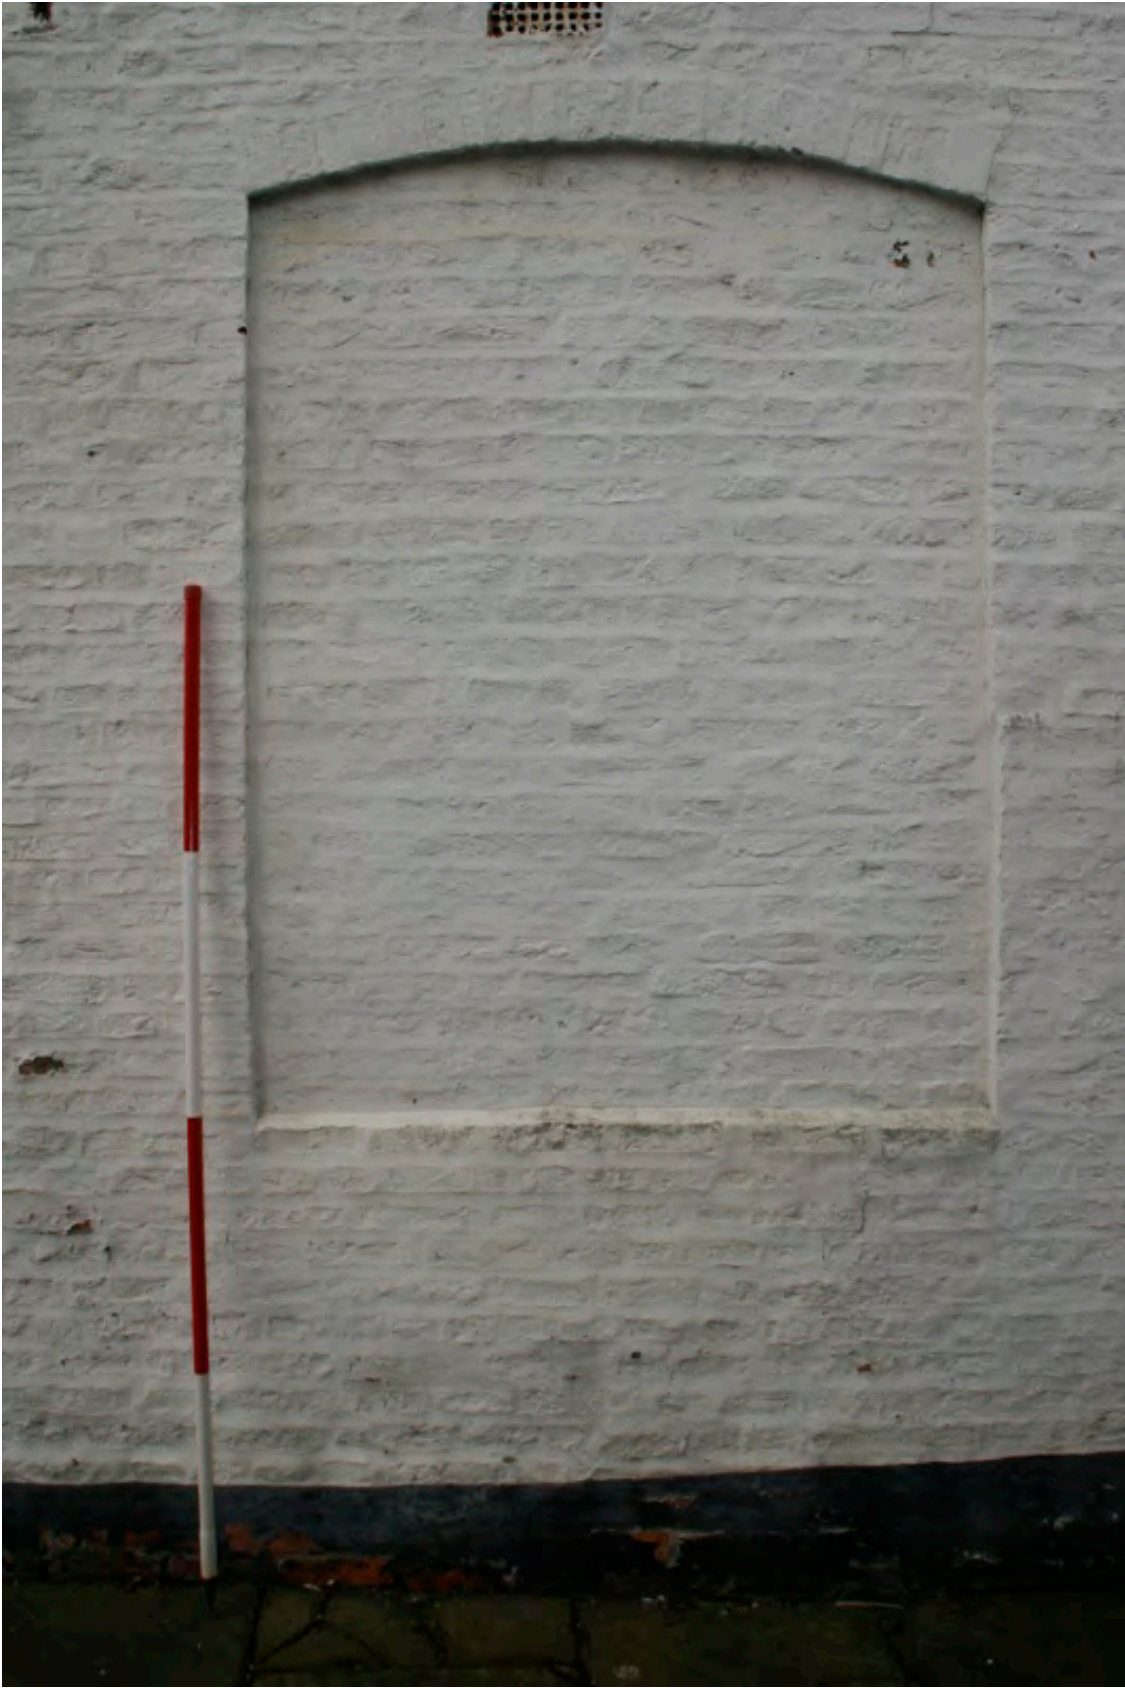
Blocked ground floor window at the north end of the front (east) elevation of the almshouses, looking west (TRC14 BHD100 (20))
